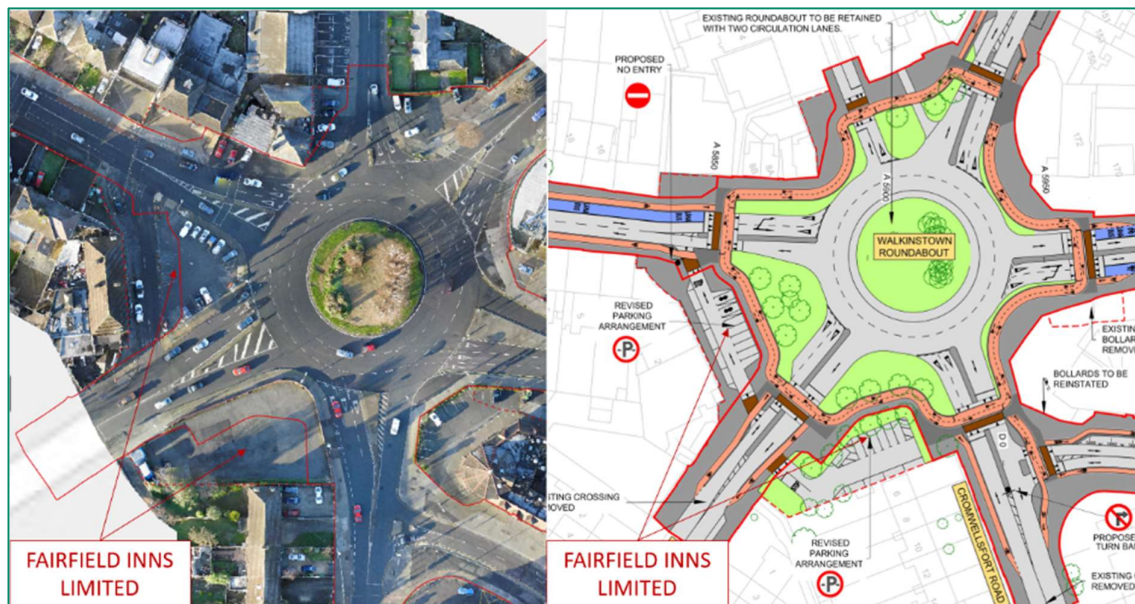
Existing and Proposed Layout at Fairfield Inns Limited property
